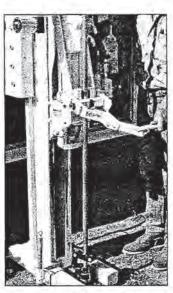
Raise the inner rod string using the probe hammer and a Rod Grip Pull Sytem if rods are too heavy to lift by hand.
